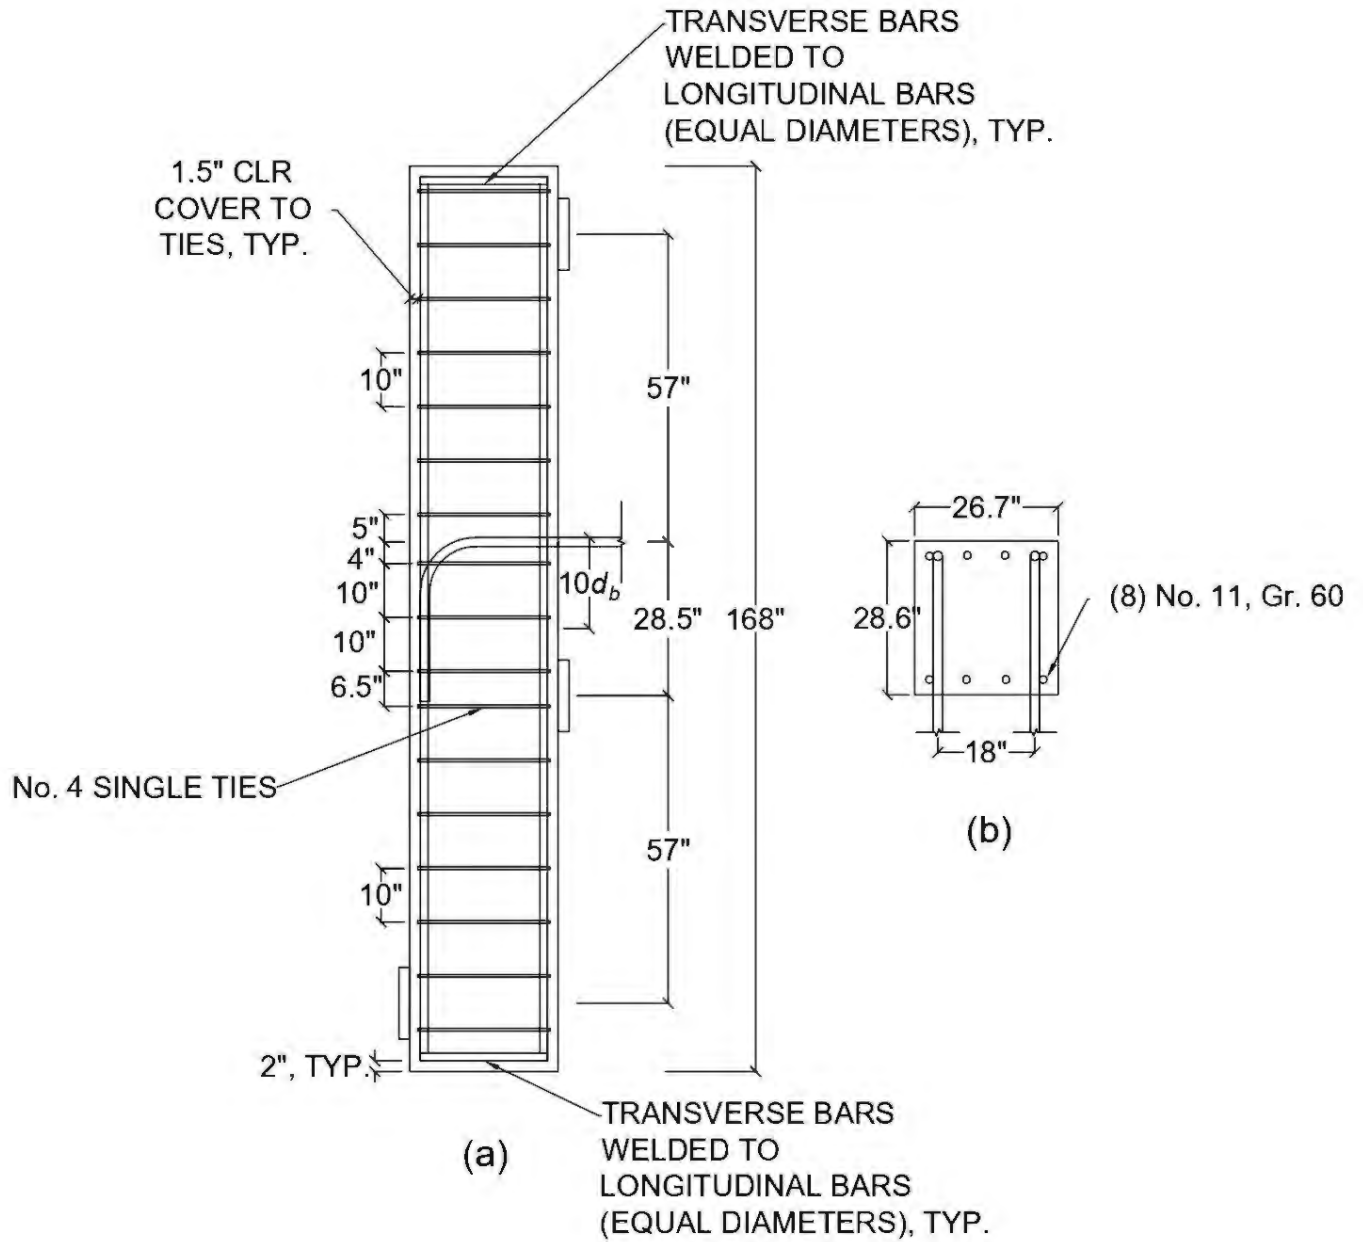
Details of reinforcement layout for No. 14 hooked bar specimen H14-16: (a) elevation, (b) cross-section
